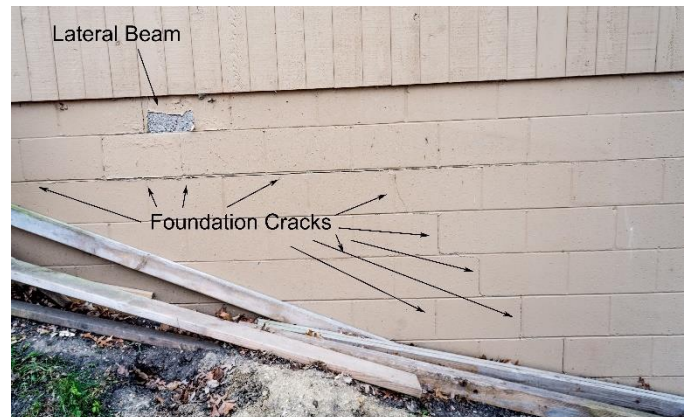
Cracks in Foundation Mortar Joints
